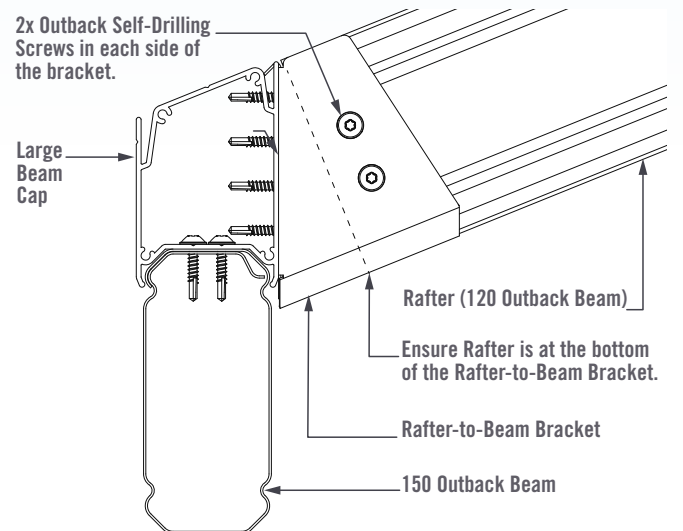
LARGE BEAM CAP - 150 SIDE BEAM - 120 RAFTER
